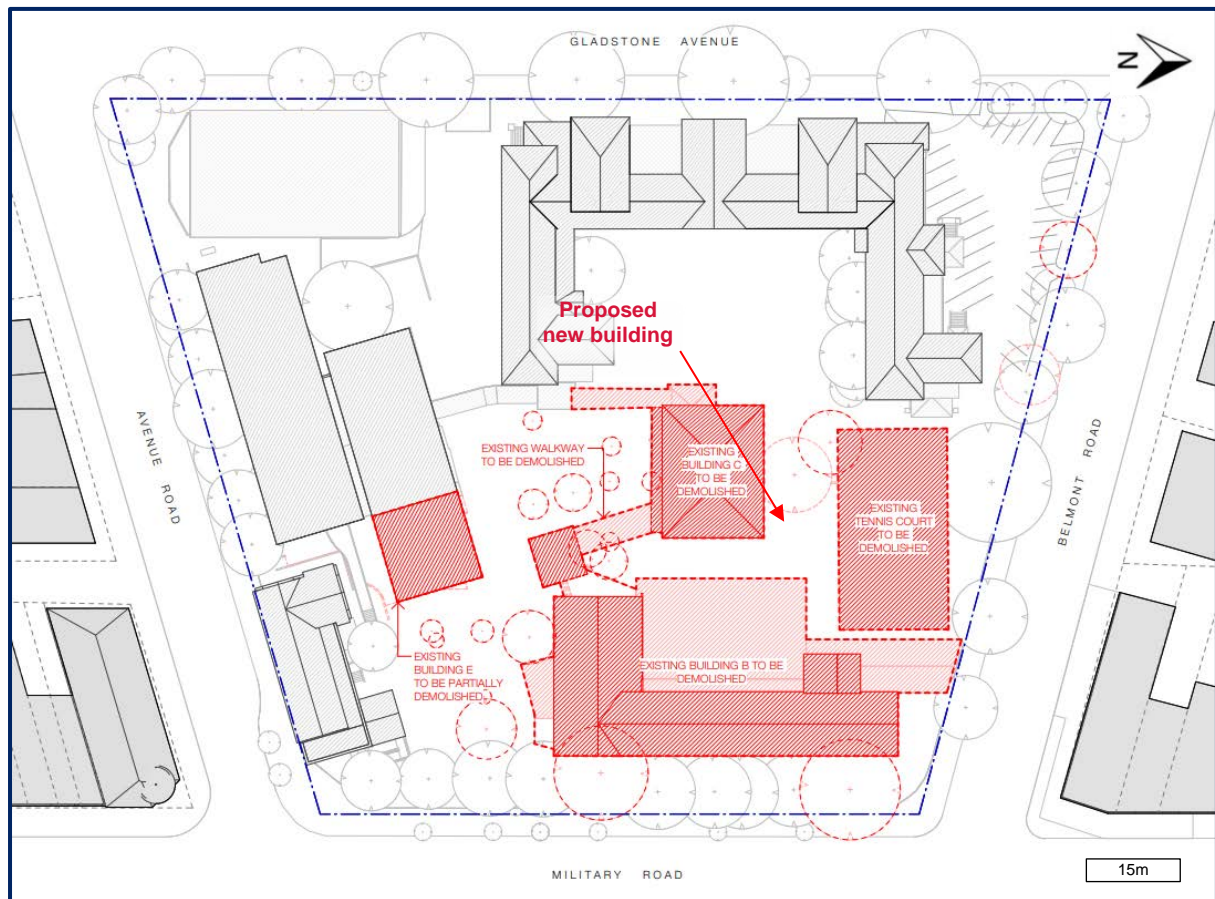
| Demolition Plan (Source: Applicant's RtS, 2021)
